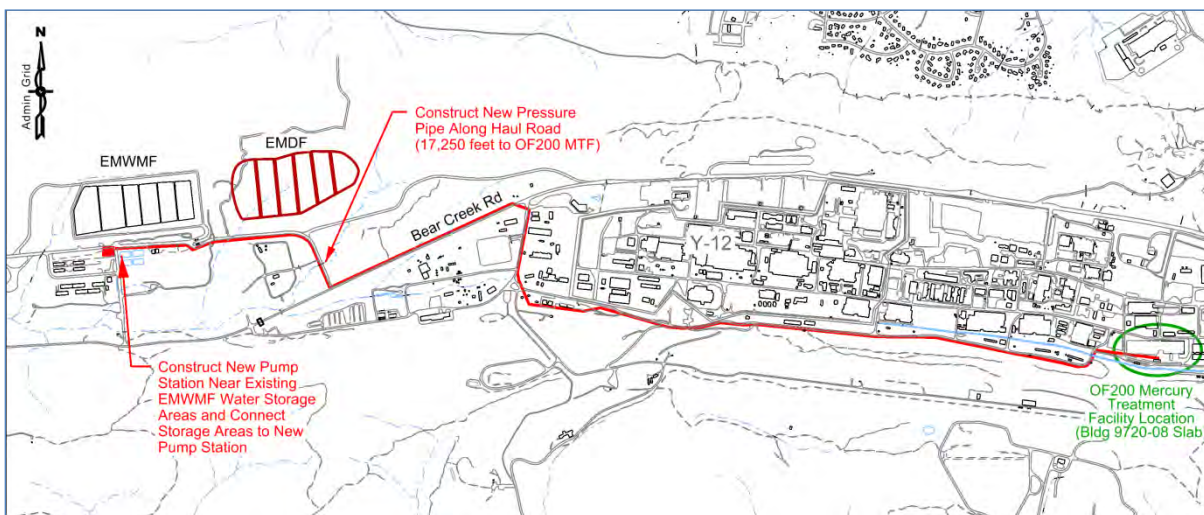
Alternative 4a: route of pipeline to Outfall 200 MTF.
